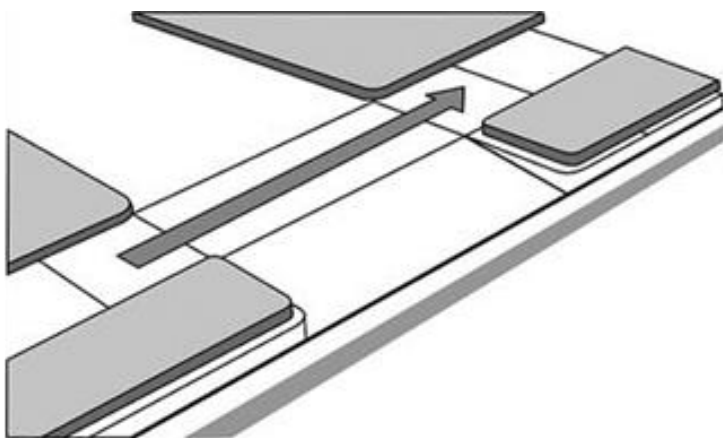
Primary driveway designed as a street, leading to off-street parking located behind the primary structure. Primary driveways should be designed as streets and should include pedestrian facilities such as sidewalks.
